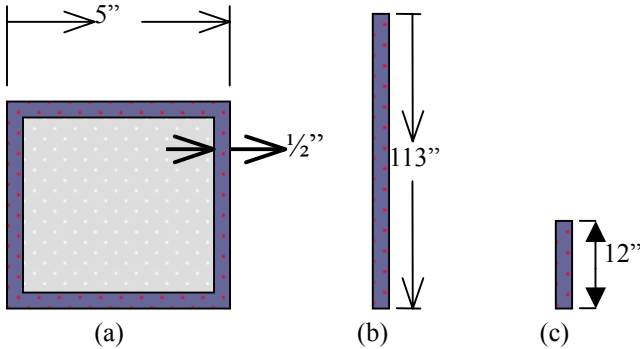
Specimen Geometry: (a) cross-section, (b) slender columns, (c) stub columns
